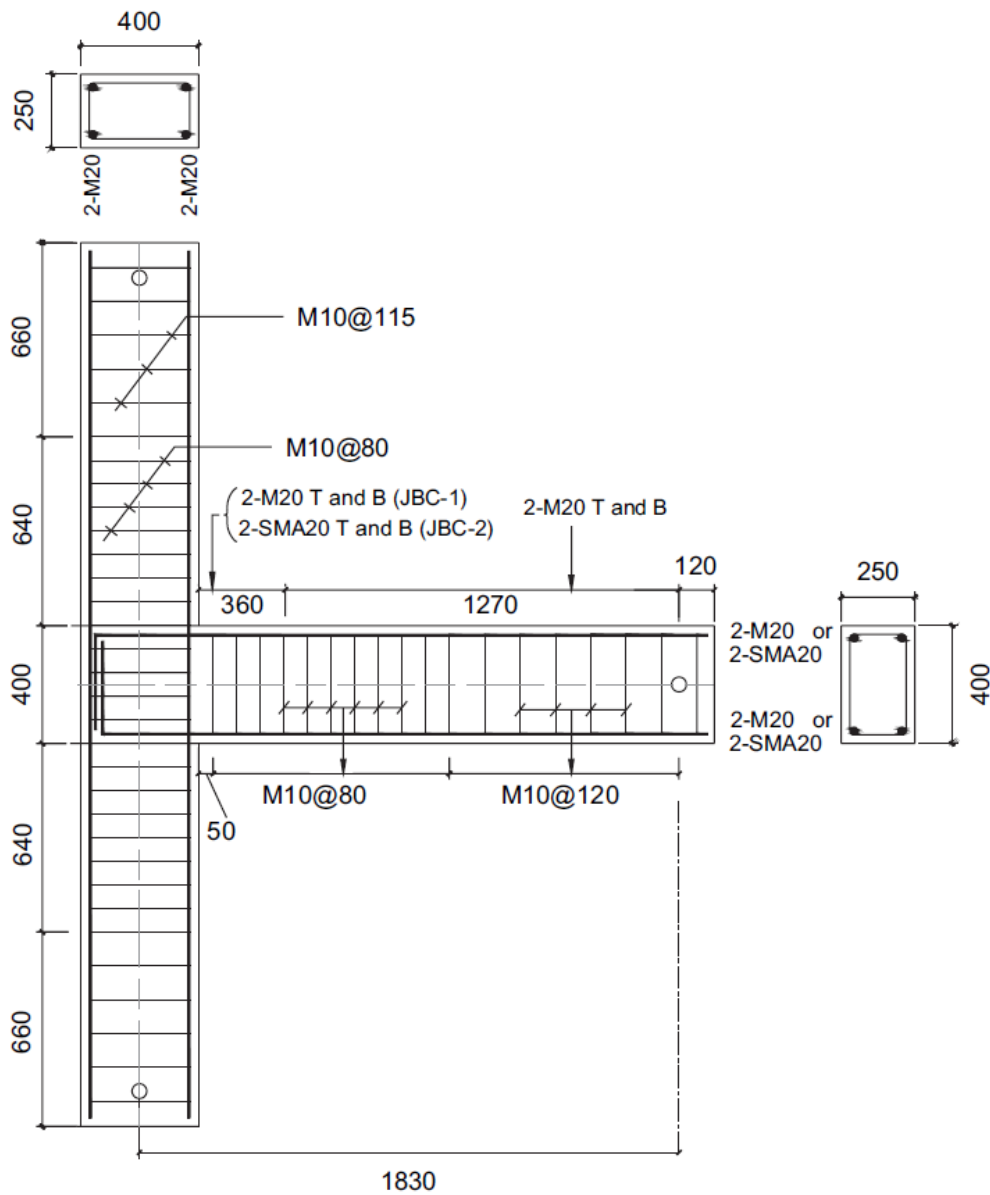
Reinforcement details of tested BCJs (Youssef et al 2008).
